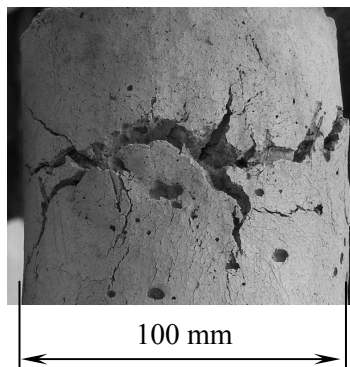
Cracked cylinder of the 05F140EA concrete mix
